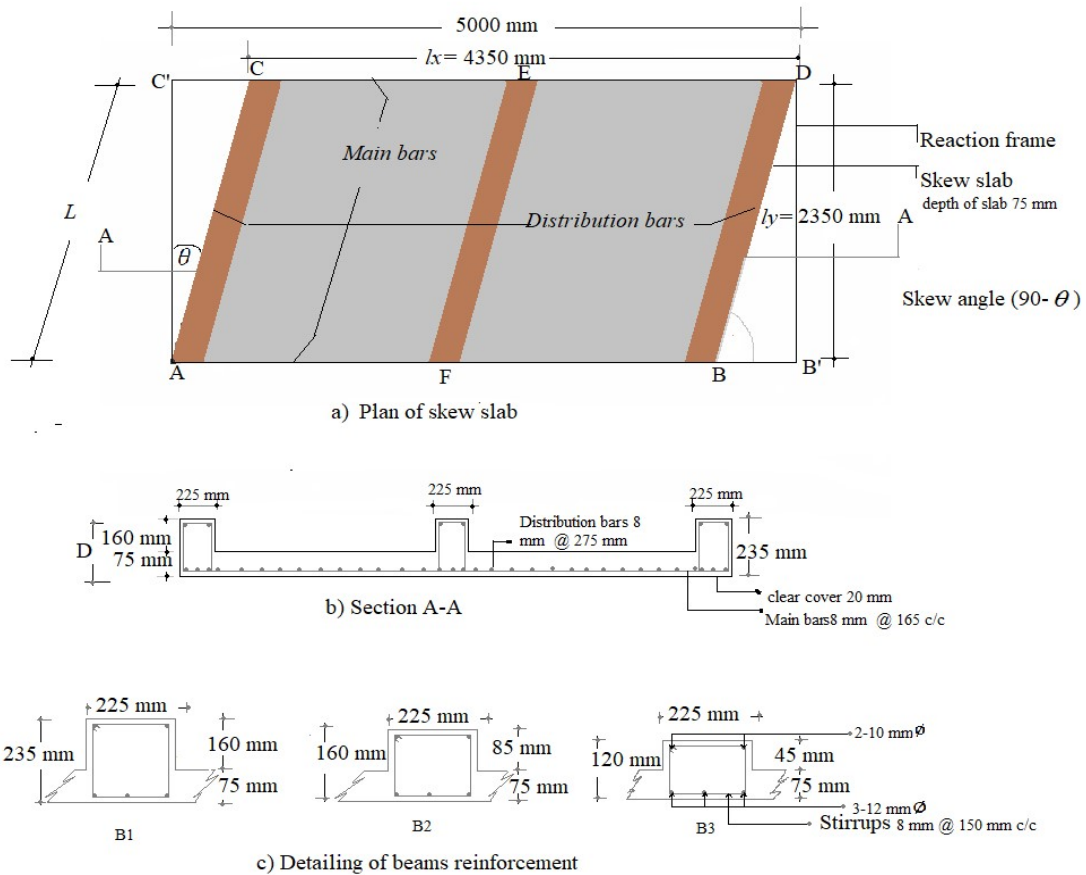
Dimensions of the nine skew slabs specimens: a) plan of the skew slab, b) section at A-A, c) detailing of beams reinforcement
